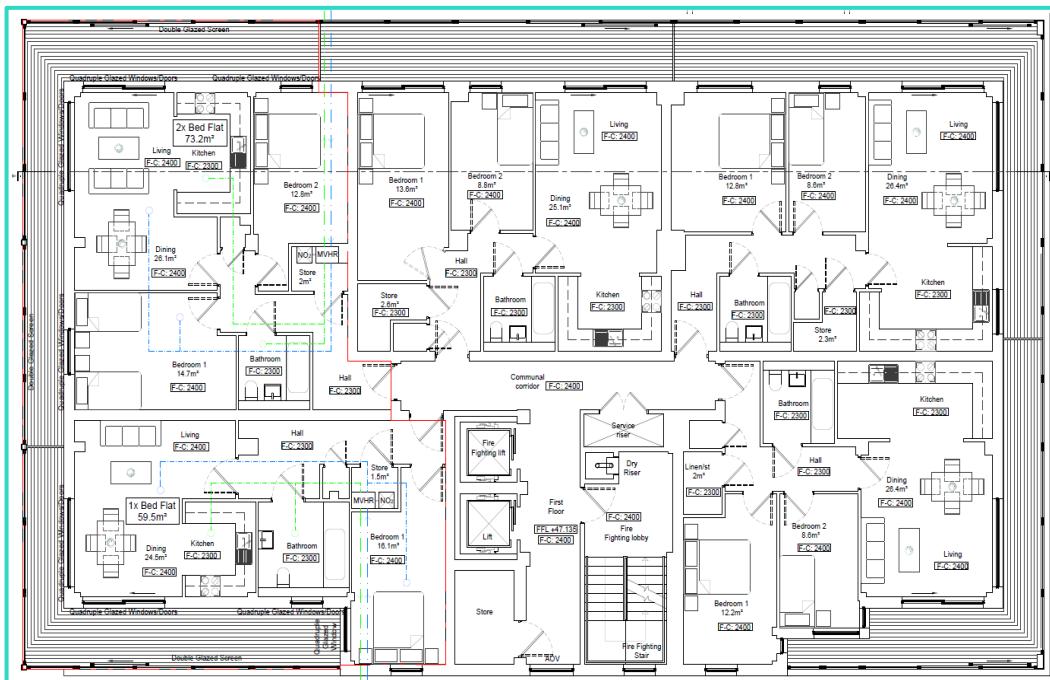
1-3 Bakers Road – Internal layout and screen configuration
